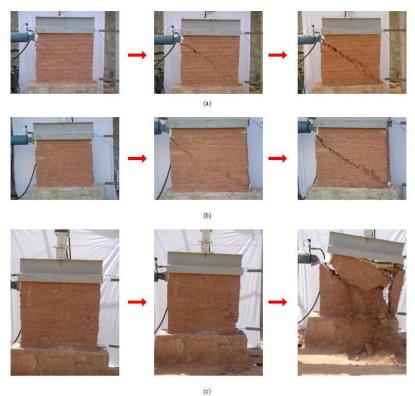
Damage process: (a) MW2 wall, (b) MW3 wall, (c) MW4 wall
